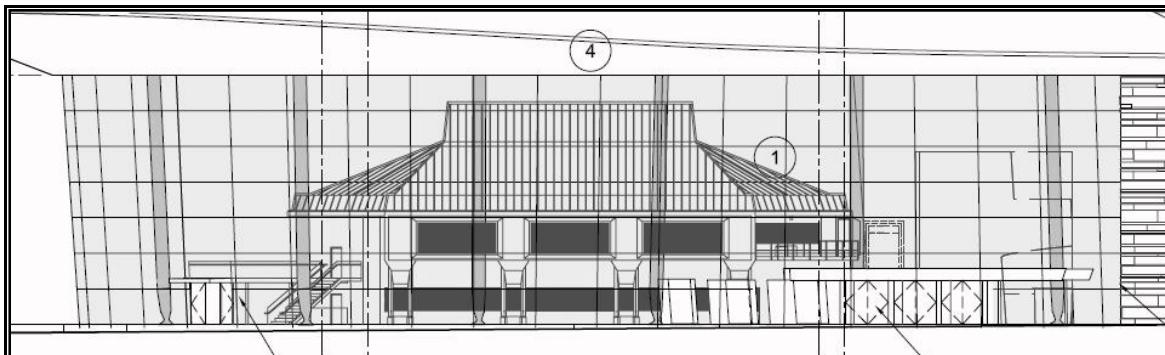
Architectural Elevation showing the faces of the façade with glazing runs at 7 frames high
